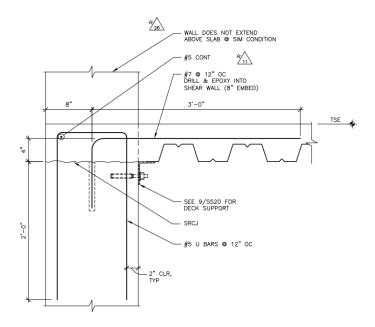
Special Reinforced Concrete Shear Wall connection detail
